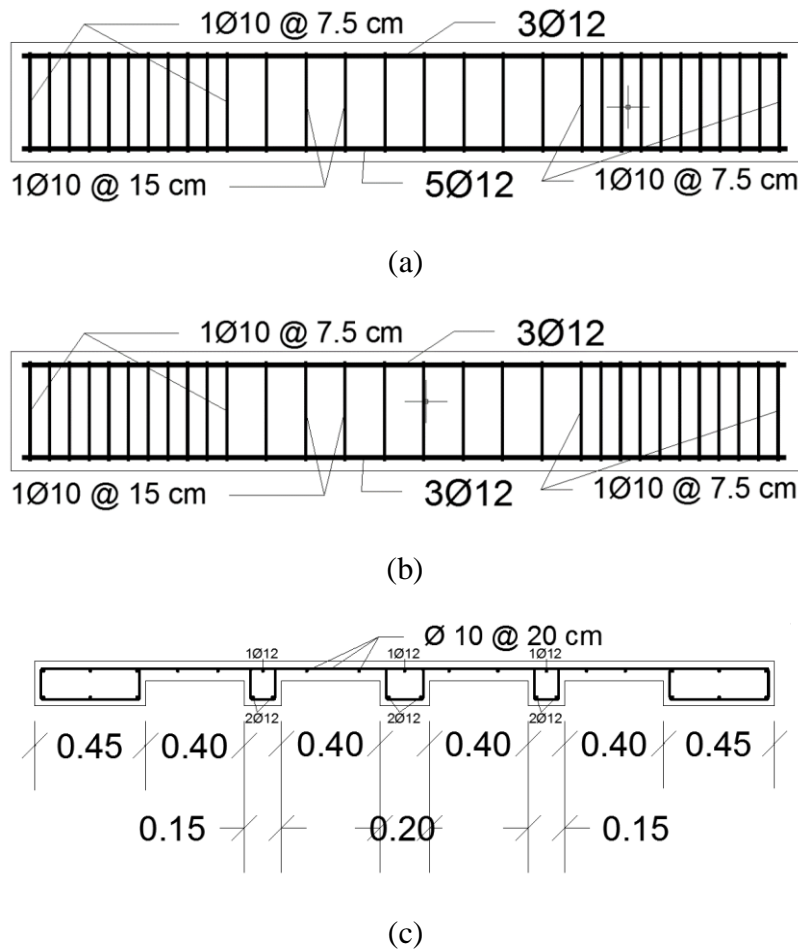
Slab reinforcement details: (a) Main beam (B.1) detailing, (b) Secondary beam (B.2) detailing, (c) Section A-A details
